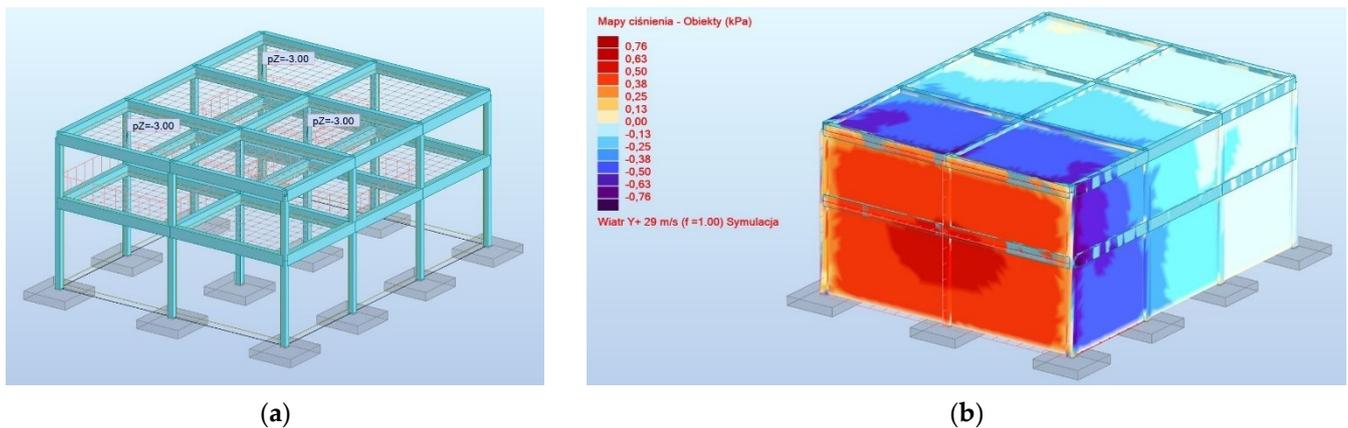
An exemplary load acting on the analyzed reinforced concrete structure: (a) example service load; (b) example wind load (push on gable wall).
